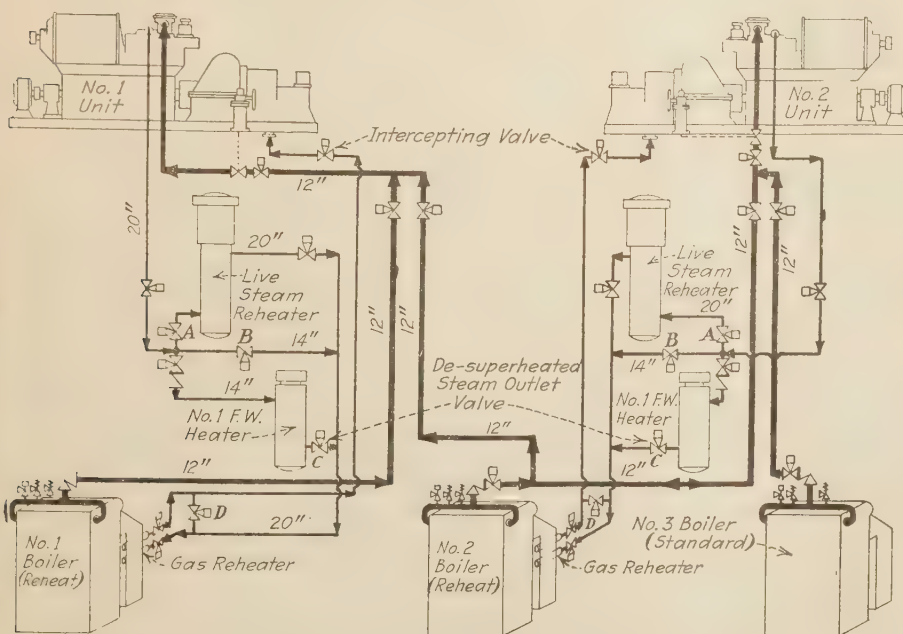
ARRANGEMENT OF BOILERS AND TURBINES USED WITH THE 1400-LB PRESSURE INSTALLATION
